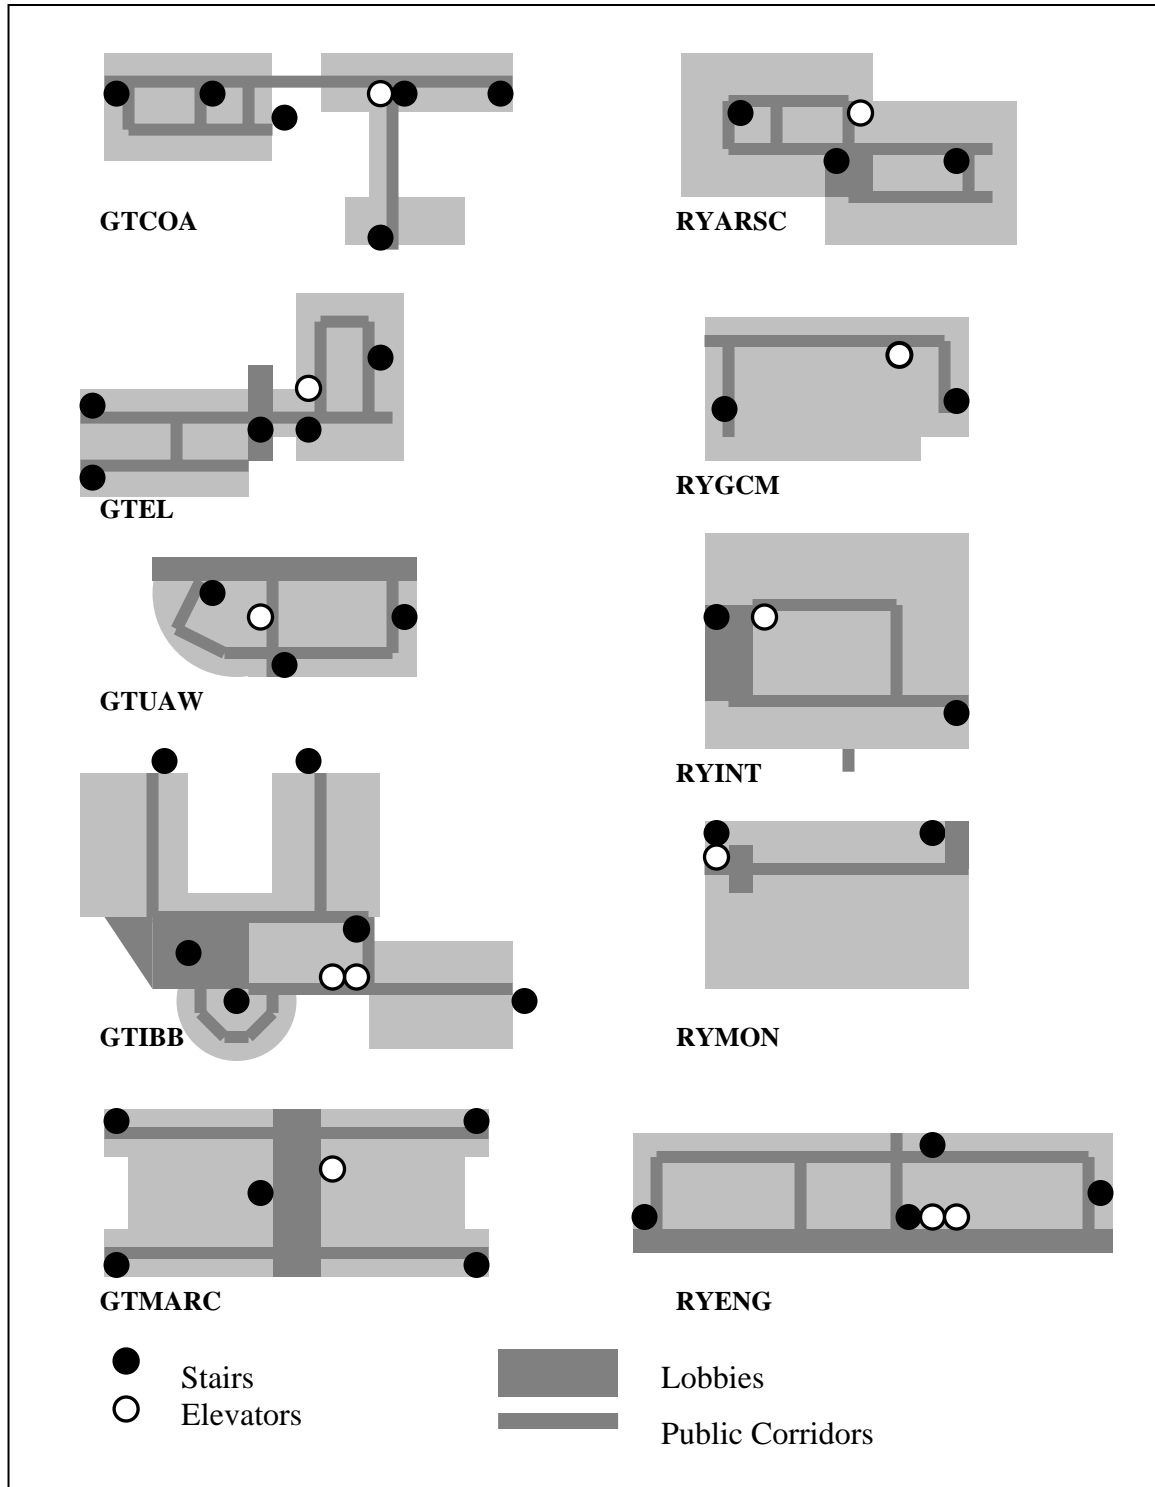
Schematic Plans of the 10 buildings of the Data Set indicating the location of Stairs and Elevators within the Arrangement of the Buildings' Circulation Systems.
